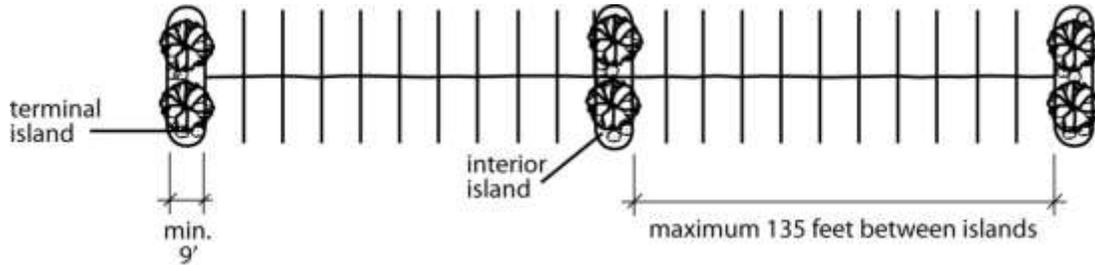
Interior Parking Lot Landscaping, Landscaped Islands
